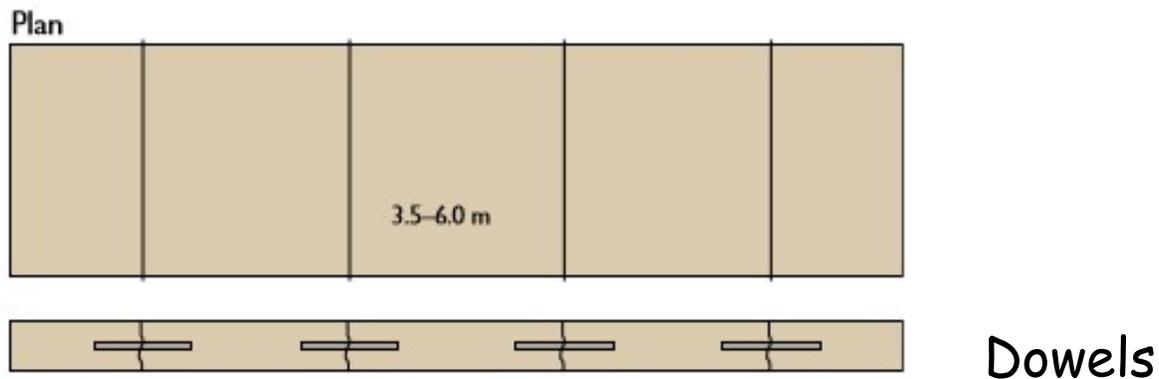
Jointed plain concrete pavement (JPCP) (courtesy: ACPA).
